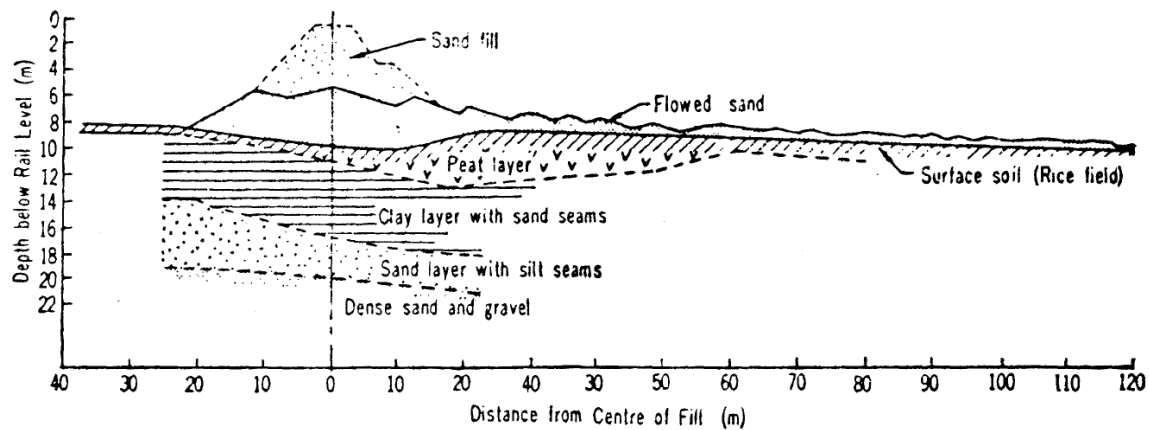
Cross-section of the Uetsu Line railway embankment showing pre-failure and post-failure geometries (from Yamada, 1966)
